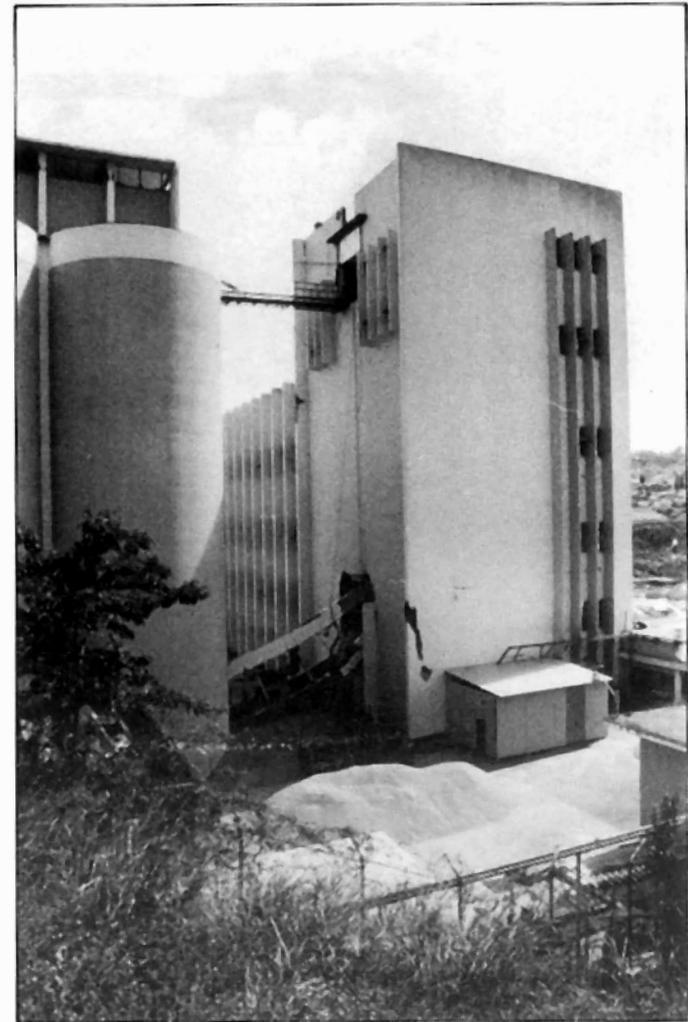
BRIDGE COLLAPSE AT FLOUR
